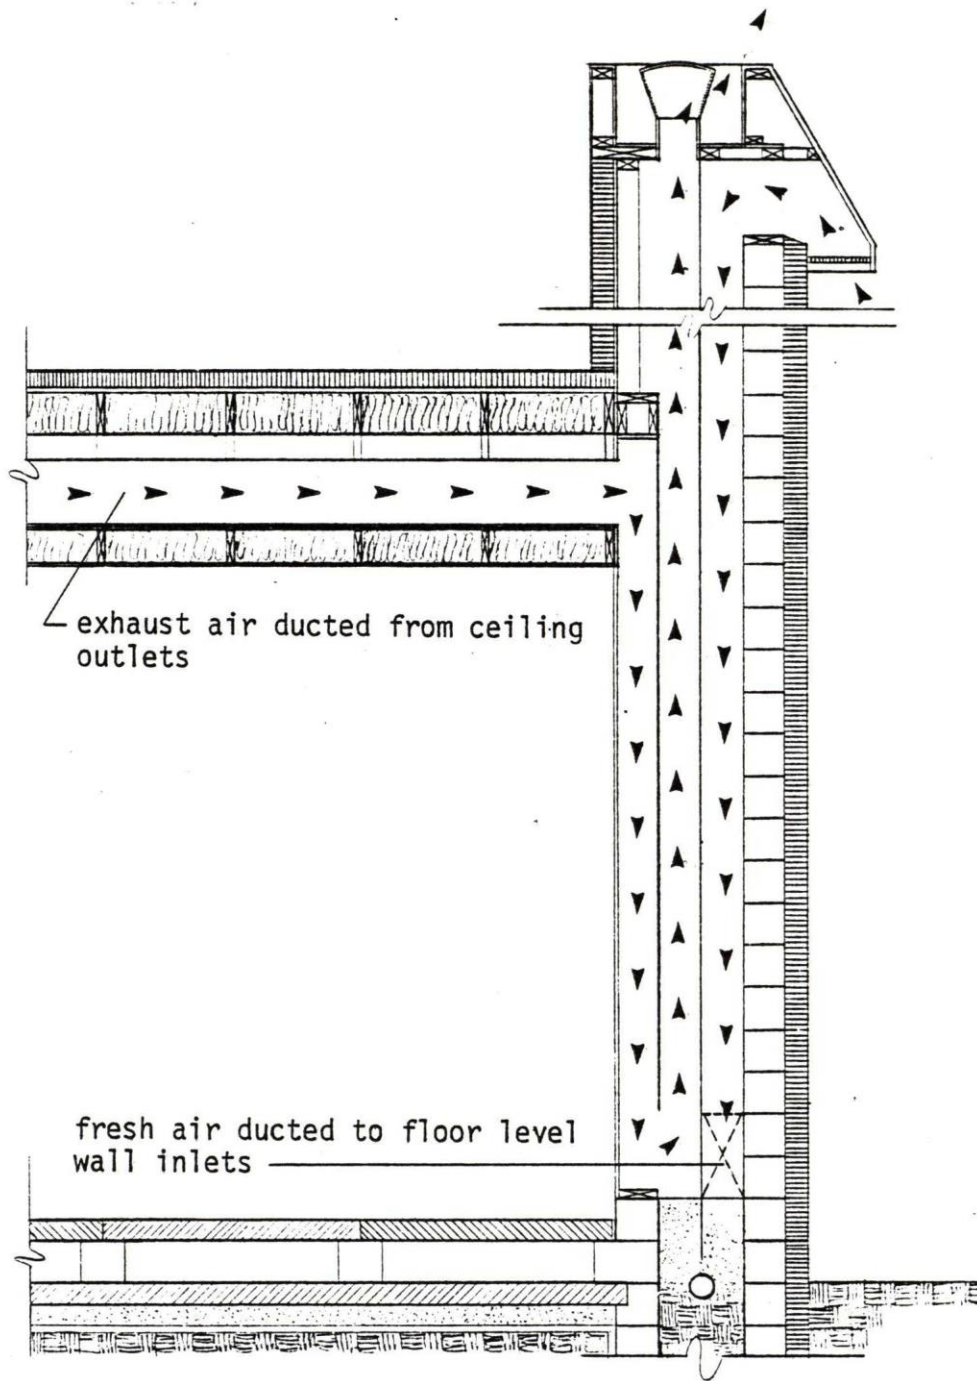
Solar CM House Air to Air Heat Exchanger Tower (Riley & Schubert, 1985)
